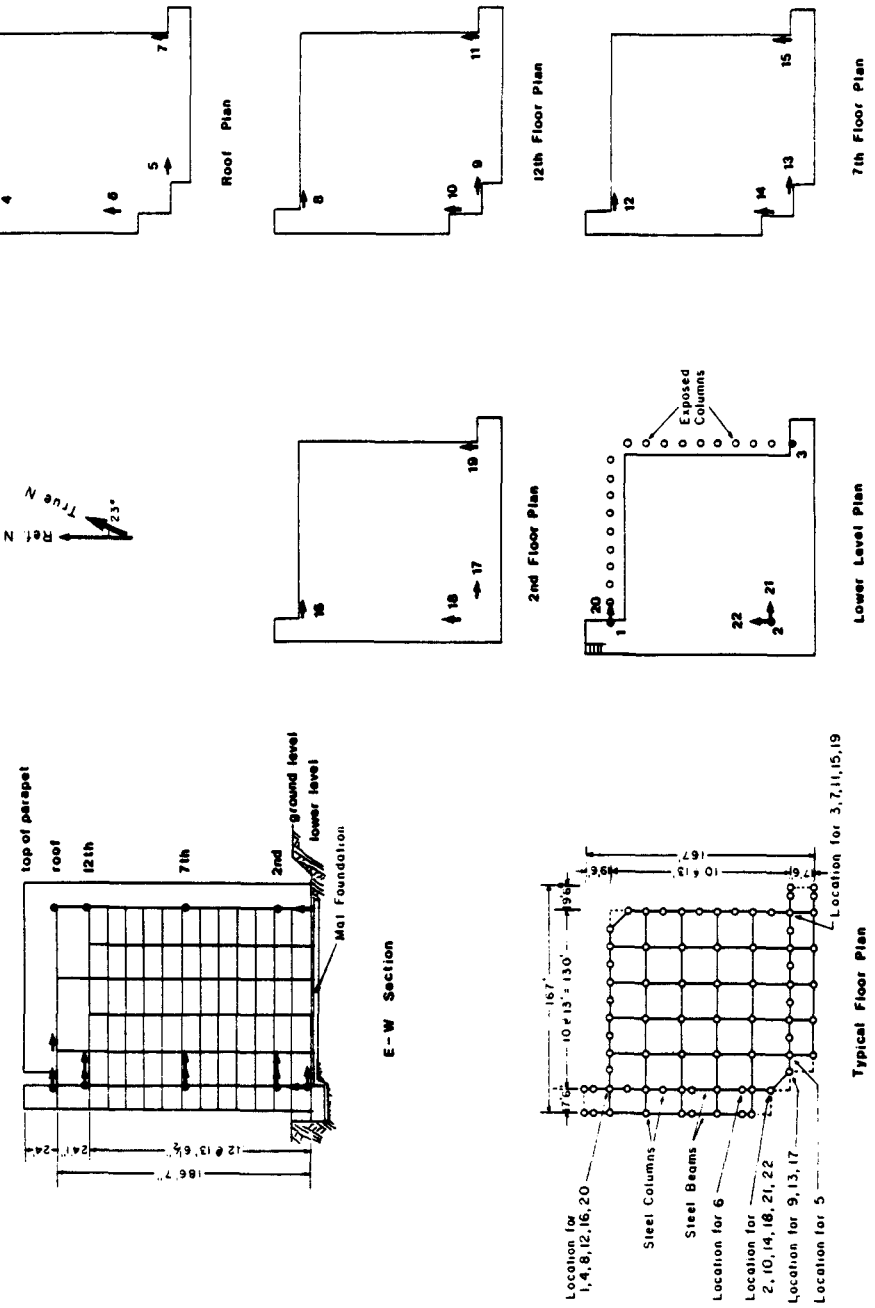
Sensor layout in Santa Clara County Office Building (6).
